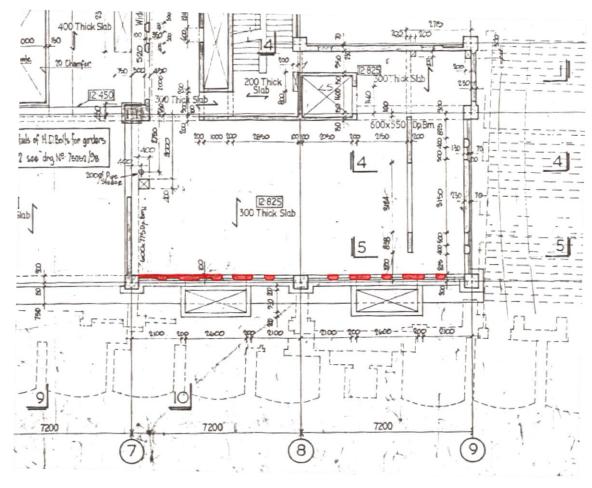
Typical concrete mullions in existing façade structure (shown in red)
